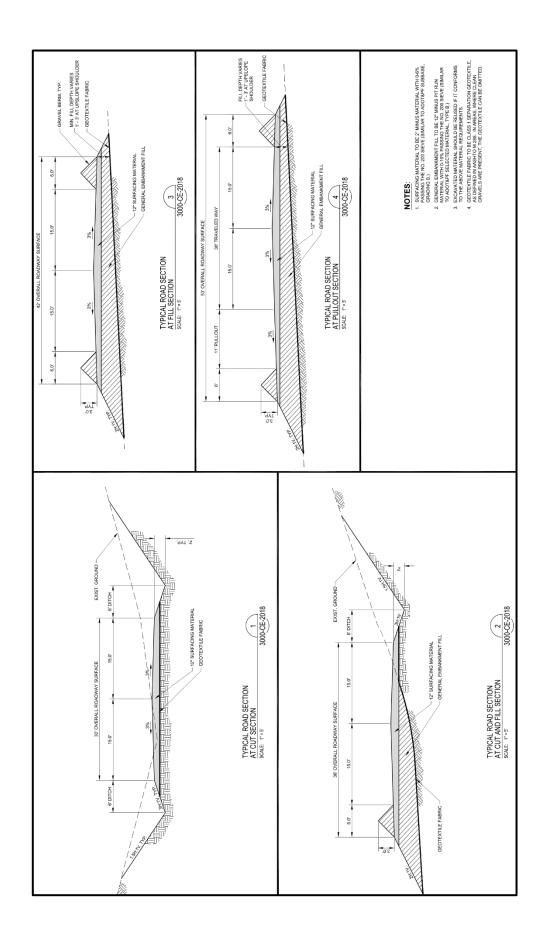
Access Road Typical Cut (top) and Fill (bottom) Sections
